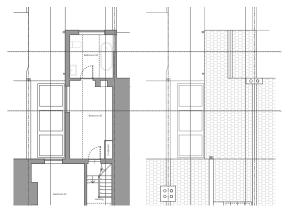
Existing outrigger - existing first floor layout and roof plan
